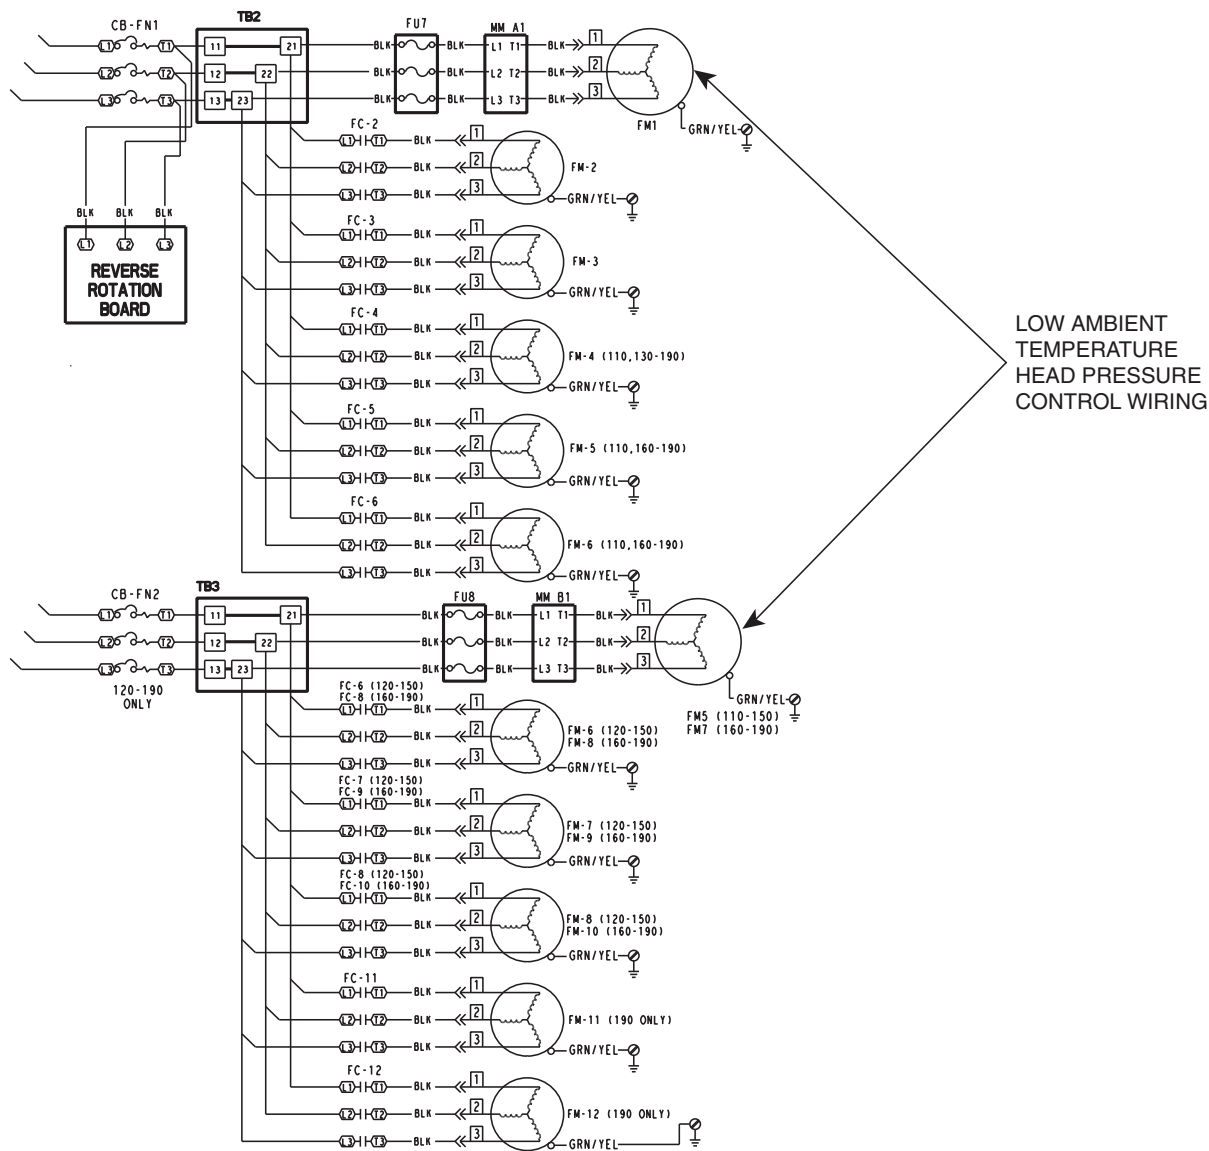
Typical Wiring, 30RB060-390 and 30XA080-501 After Low Ambient Temperature Head Pressure Control Installed (30RB110-190 Shown)
